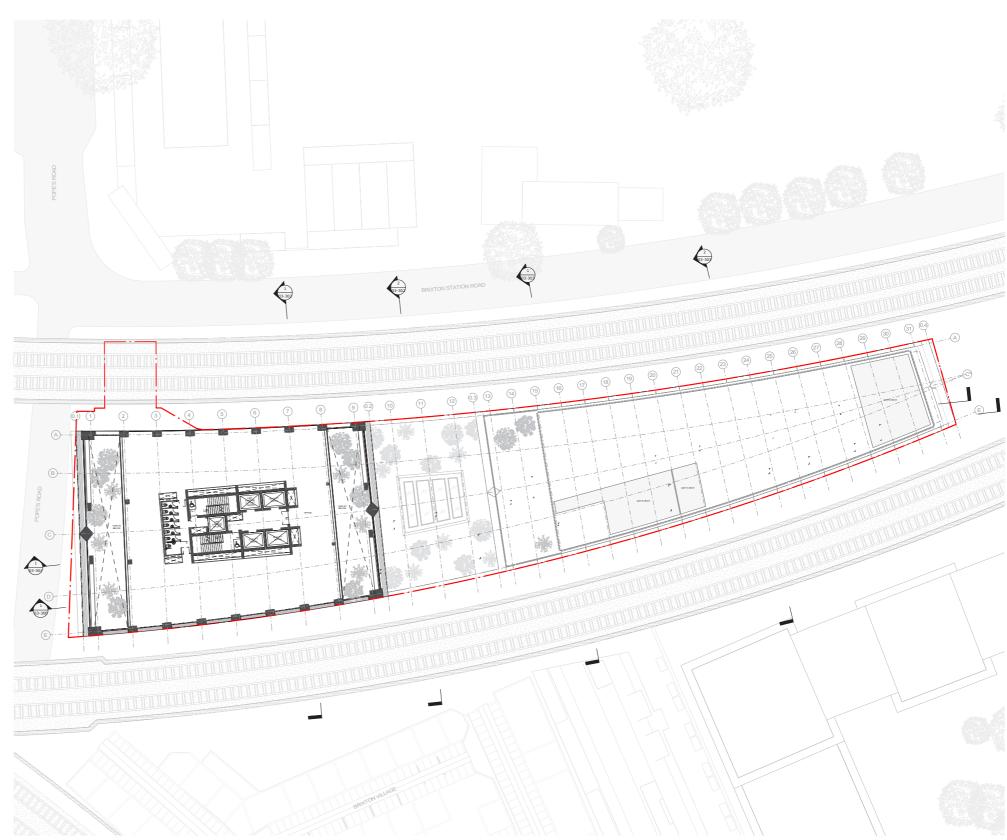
Fourteenth, sixteenth and eighteenth floor plan
